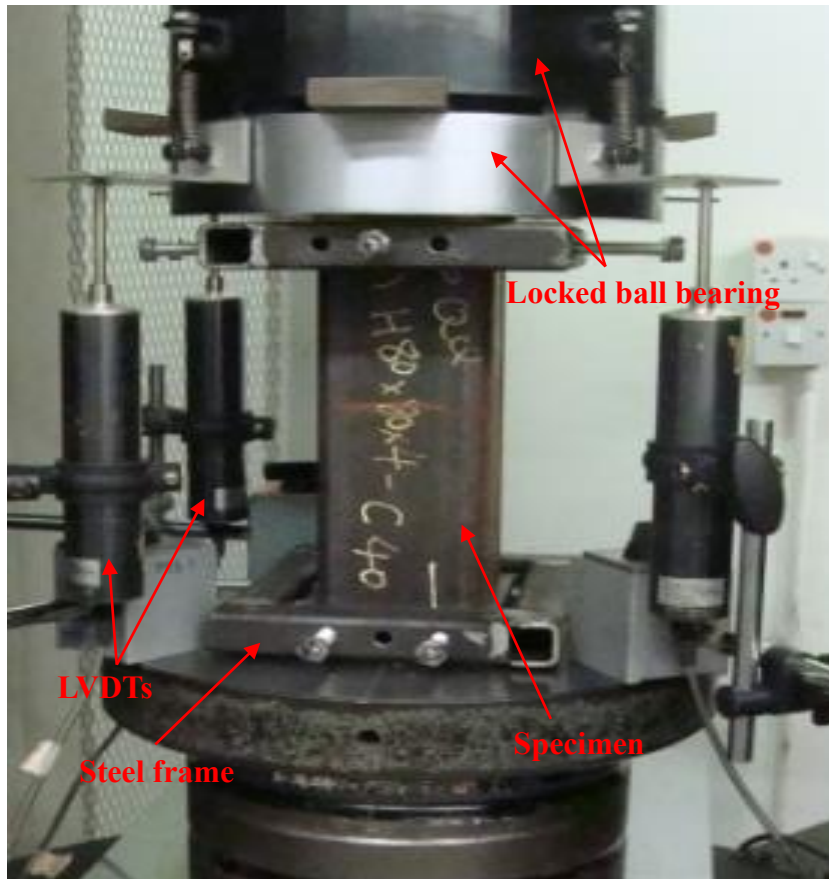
Test setup of concrete-filled stub column Specimen 80×80×4-C40-A
